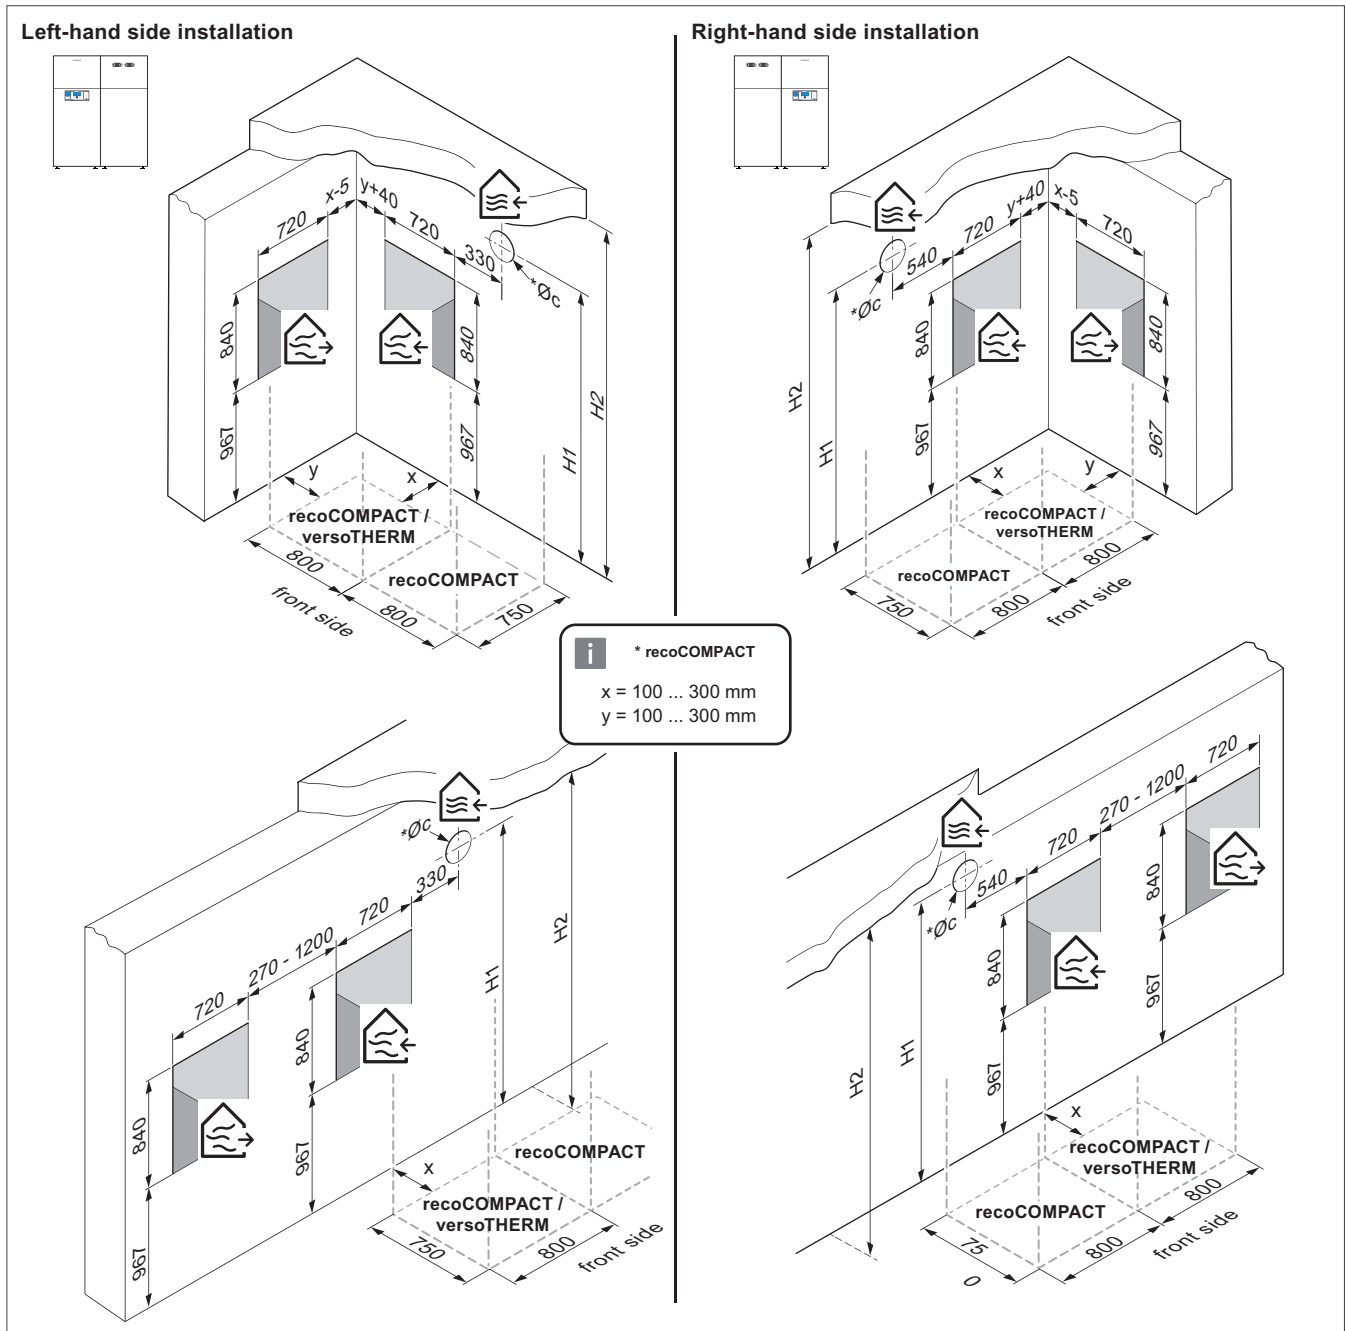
Wall-opening dimensions when using Vaillant air ducts
